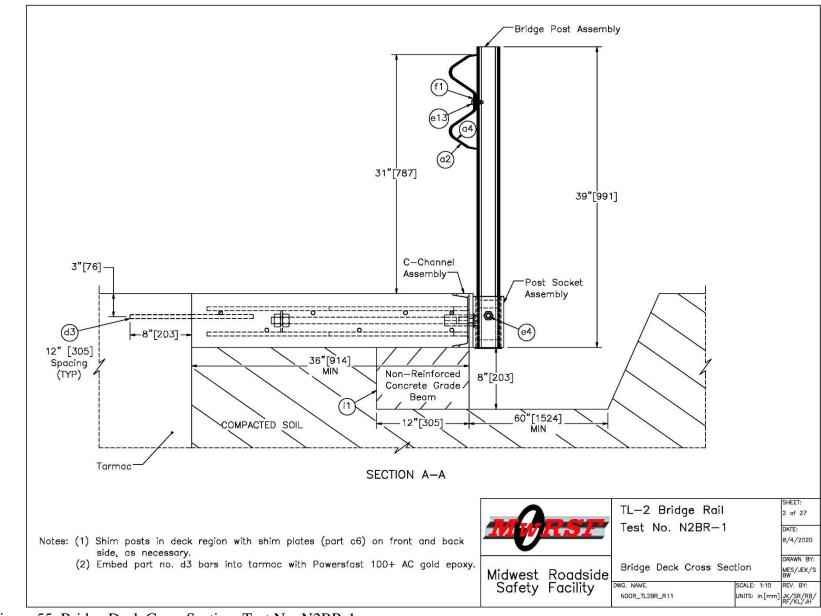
Bridge Deck Cross Section, Test No. N2BR-1
